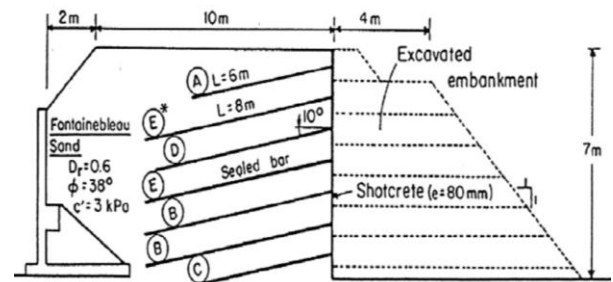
Specifications of walls and nails used in CLOUTERRE project (Plumelle and Schlosser 1990)
